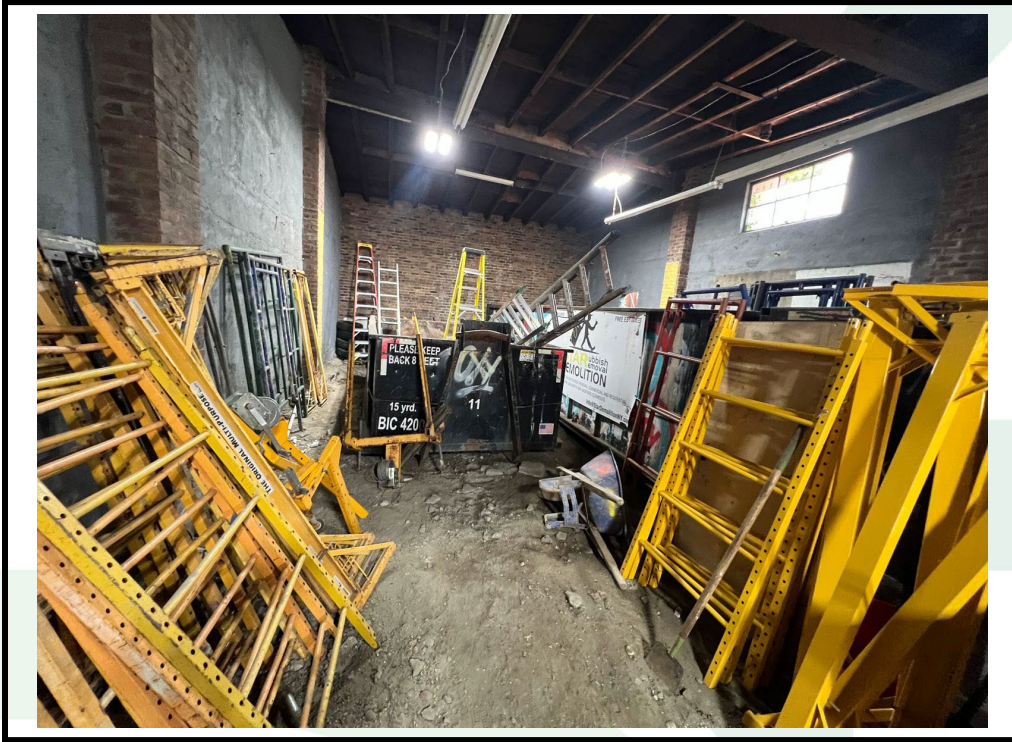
PHOTO LOCATION: Depicts the interior of the building, with no concrete floor slab.
